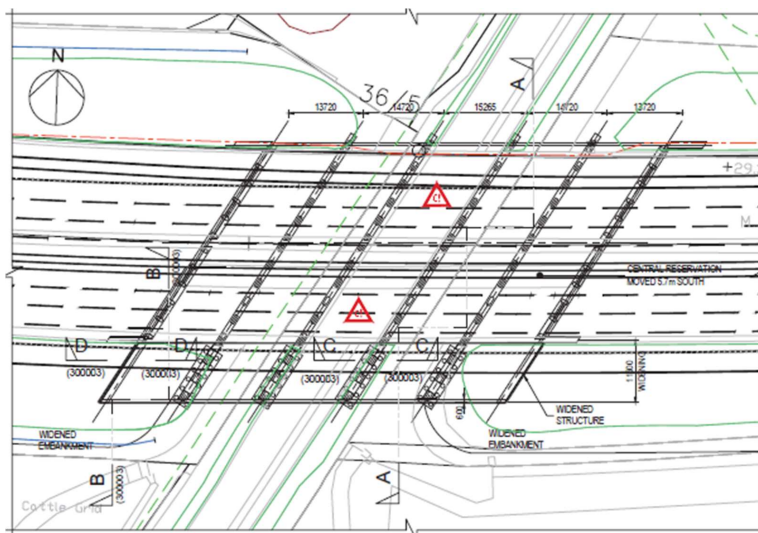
Typical arrangement of asymmetric widening at Windsor Branch railway bridge
